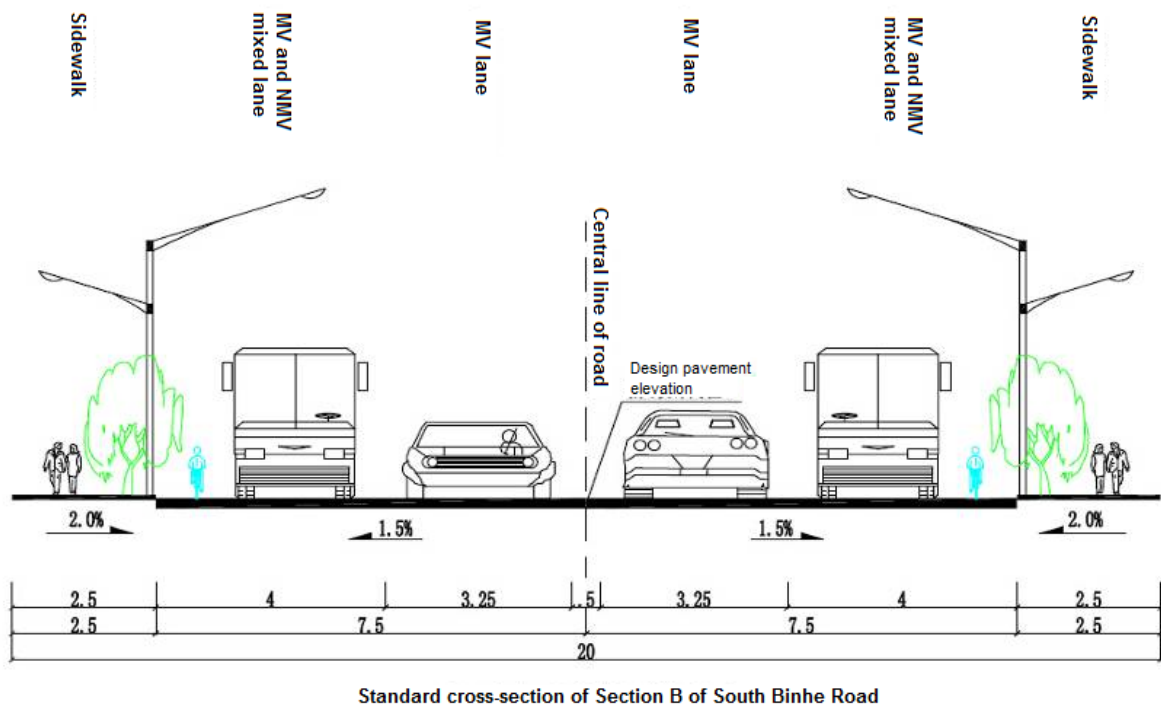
Cross-sectional Diagram of Urban Branch Road
